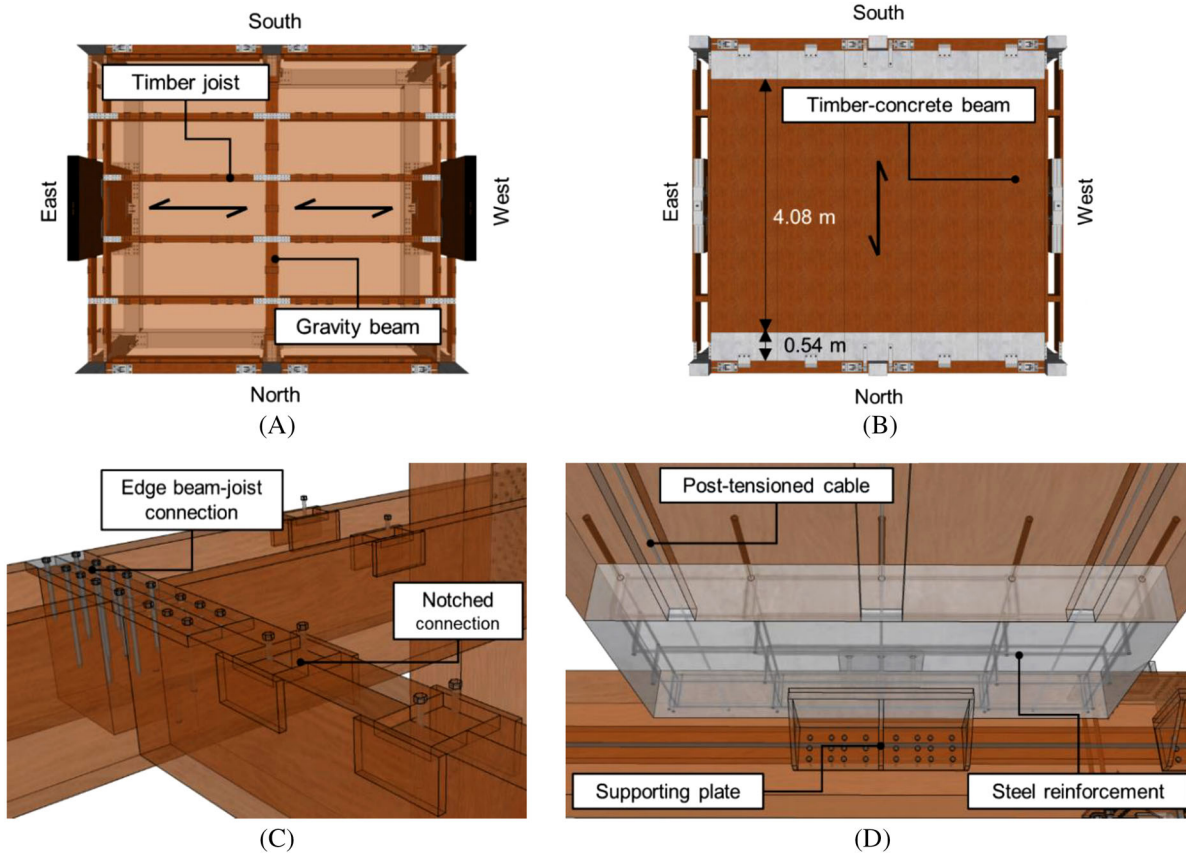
Plan views and details of: (A–C) Timber-Concrete Composite flooring system; (B–D) 3PT prestressed flooring system.
